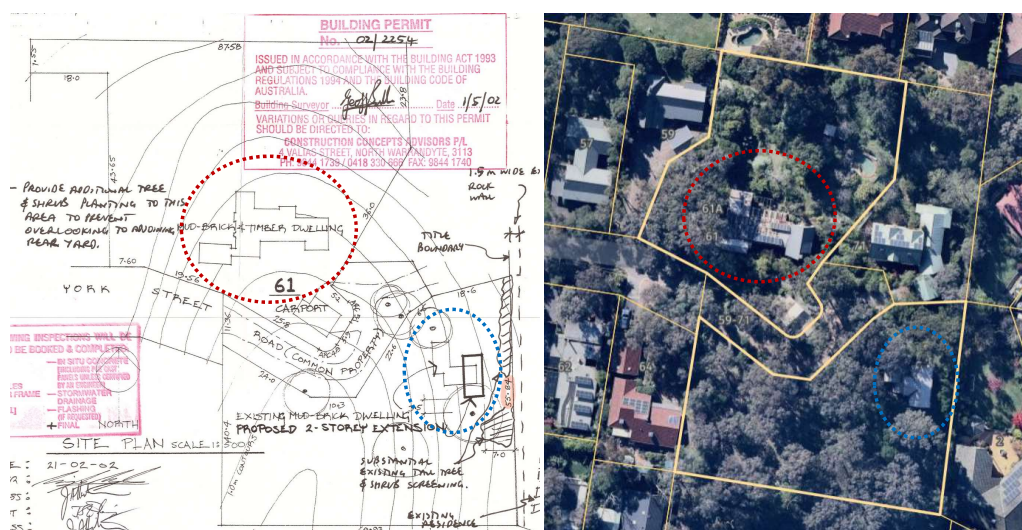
Site plan prepared in 2002, showing the structures of interest (left), and the aerial view of the subject site, with the site boundary outlined in thicker yellow lines (right). Note the house comprising 1948, c1948 and 1959 sections (outlined in red) and a freestanding 1950 pottery now converted to a house (blue). (Source: BP 02/2254; Nearthmap 2021)
